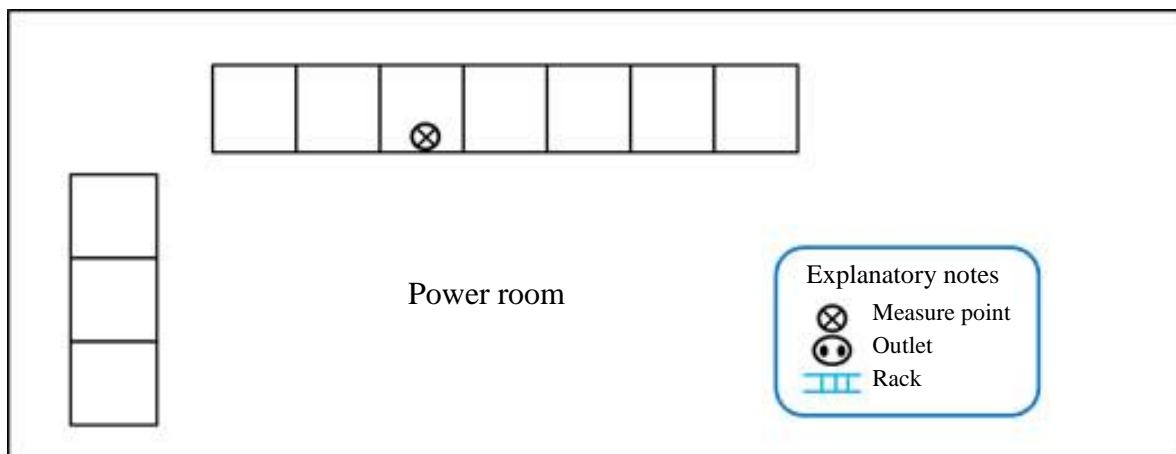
Plan view of the power room (on the 2nd basement floor)
